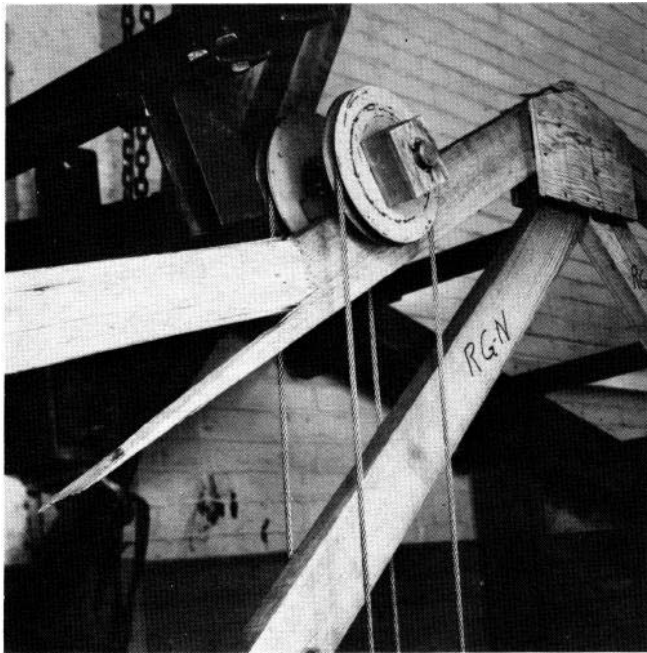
Typical failure of trussed rafters in upper chord between peak and compression member. (M 132865)
